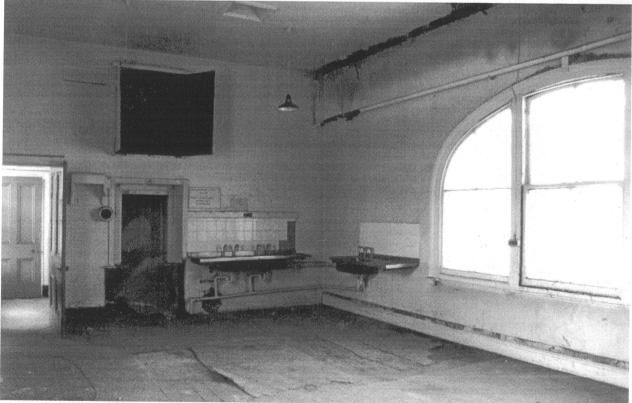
Room 1, First Floor, Building 6: Dumb-Waiter in situ
